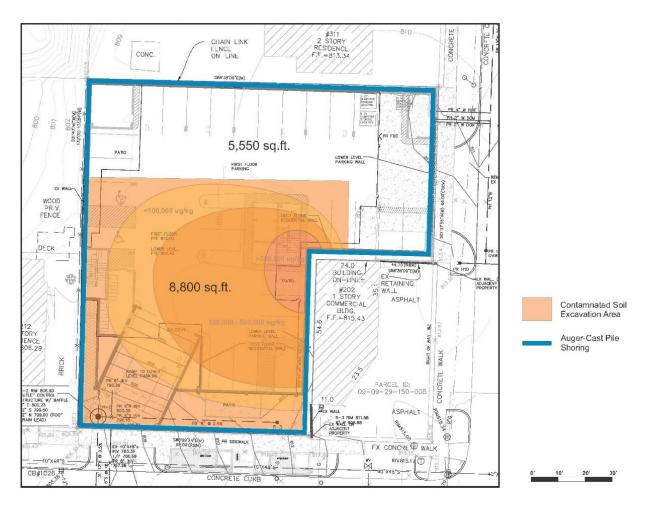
Area of Proposed Contaminated Soil Excavation - SME
